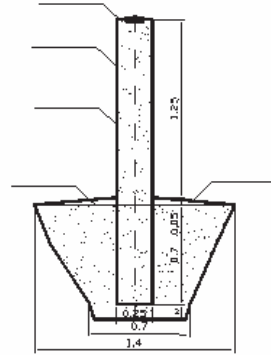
Construction of the pillar of the station, control points and points for orientation.
